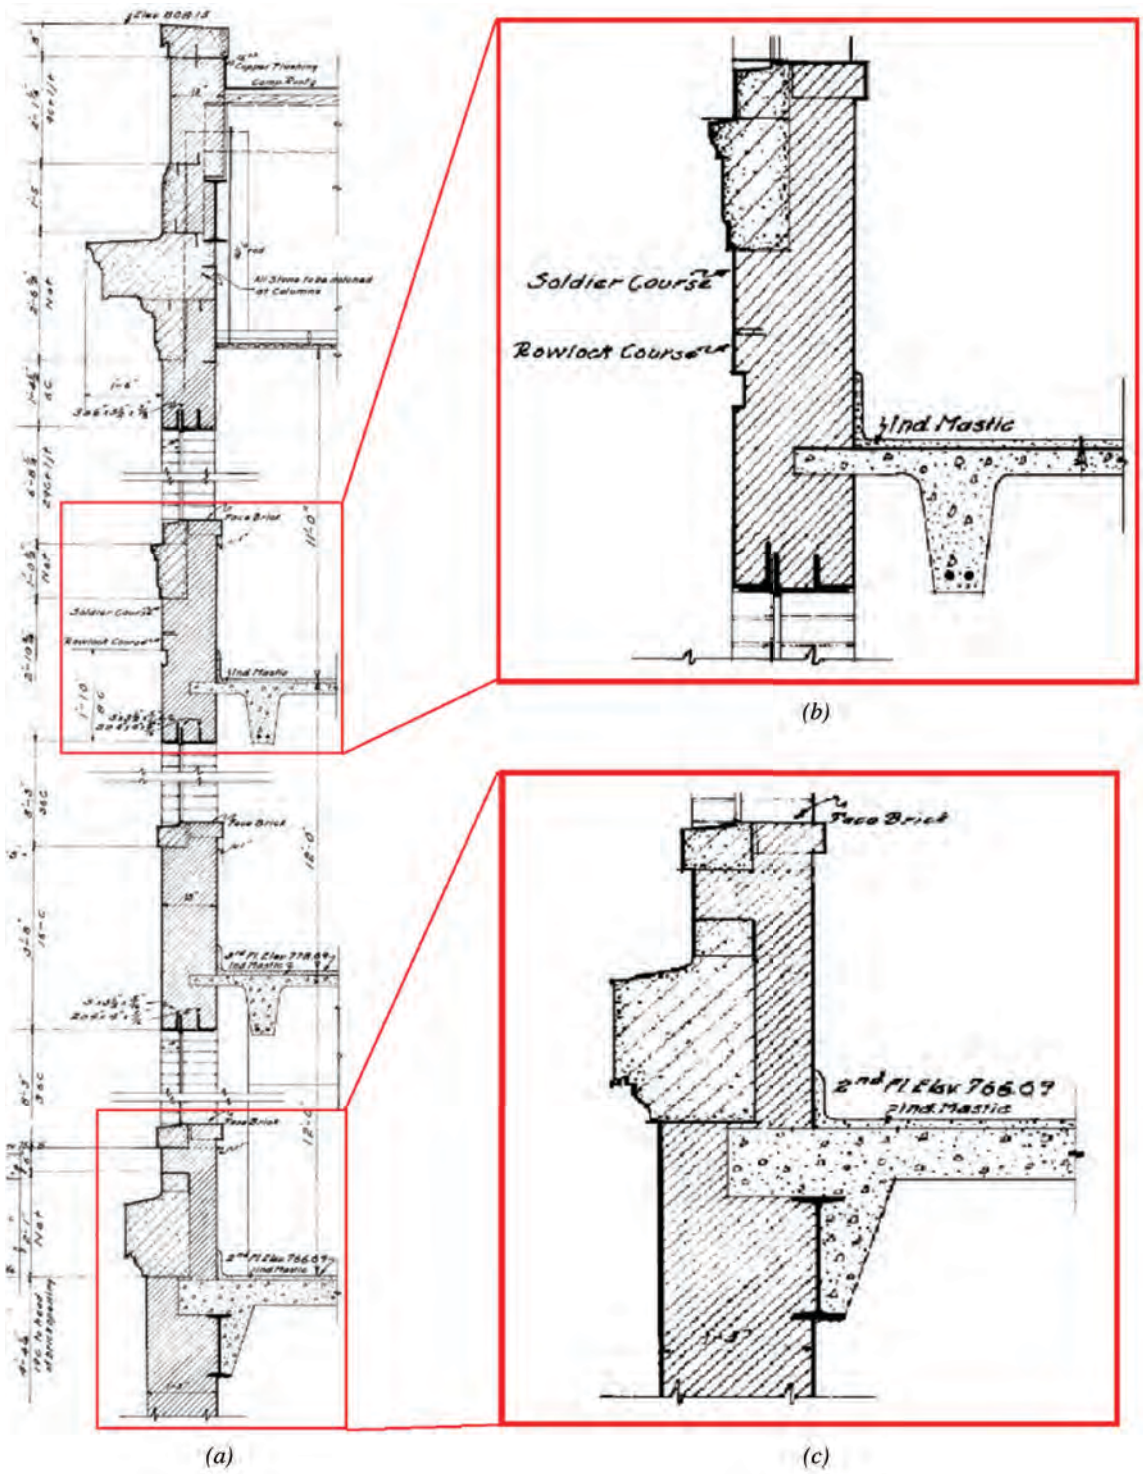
(a) Façade cross-section from original drawings; (b) close-up of second floor; (c) close-up of fourth floor.
